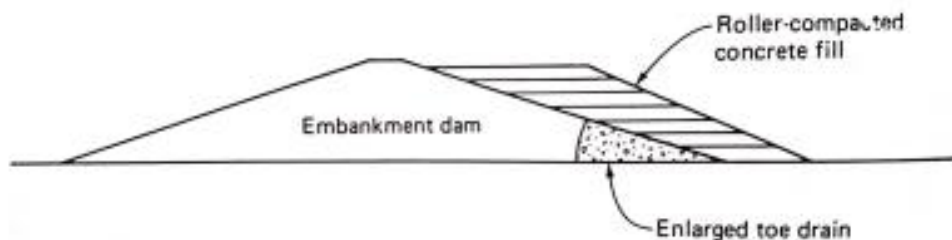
Remedial action for stability problem in an embankment dam [3]
